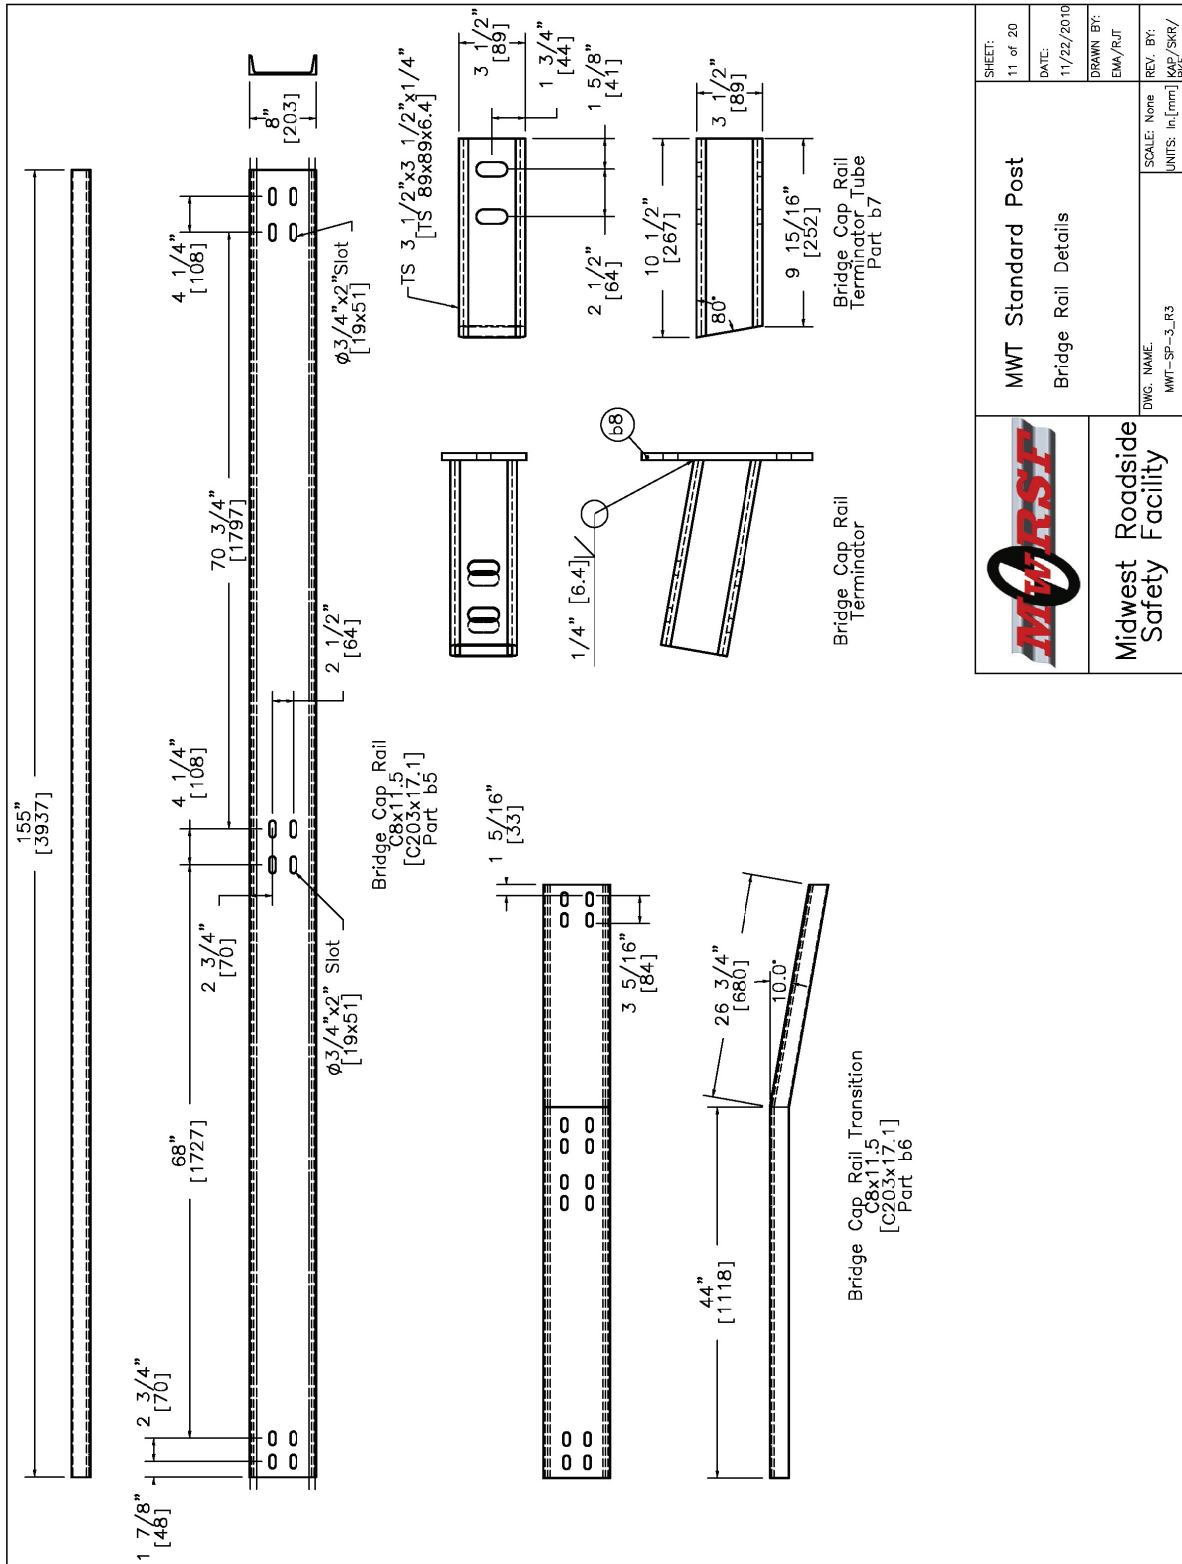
Bridge Rail Cap Details, Test Nos. MWTSP-1 through 3
